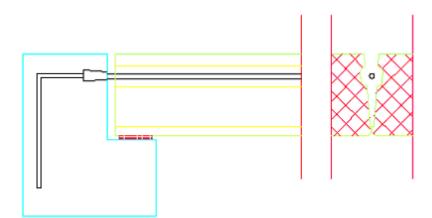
Connection between edge beam and channel plate (along line 4 of figure 10.2) and location of rebar in seam between two plates.
